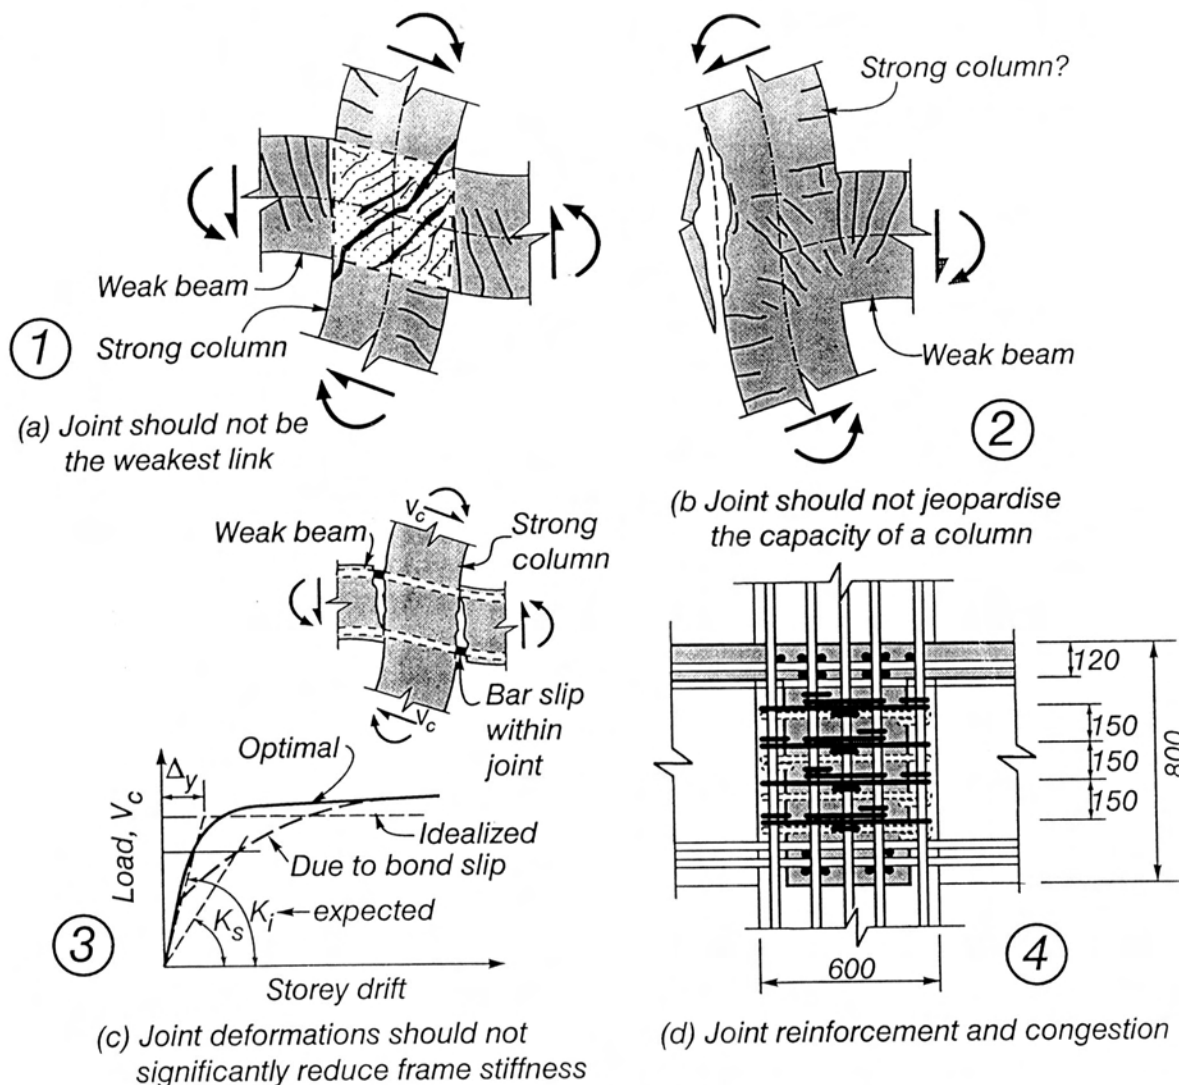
Illustrations of the criteria for the design of beam-column joints.
